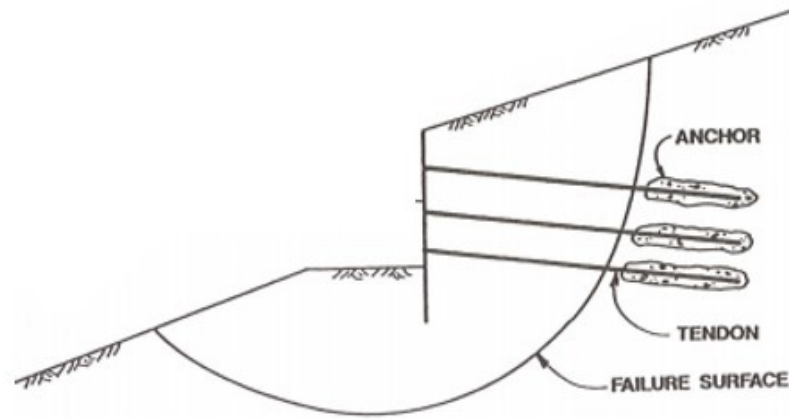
Soil nails extend past the failure surface to provide stability (from Abramson et al., 2002)
